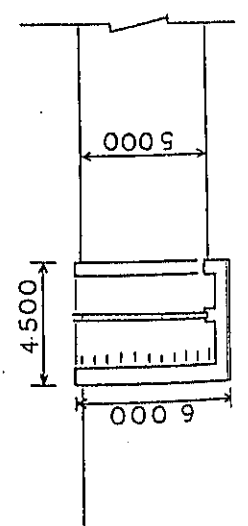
General Plan for Wadi Musherib Test Work
